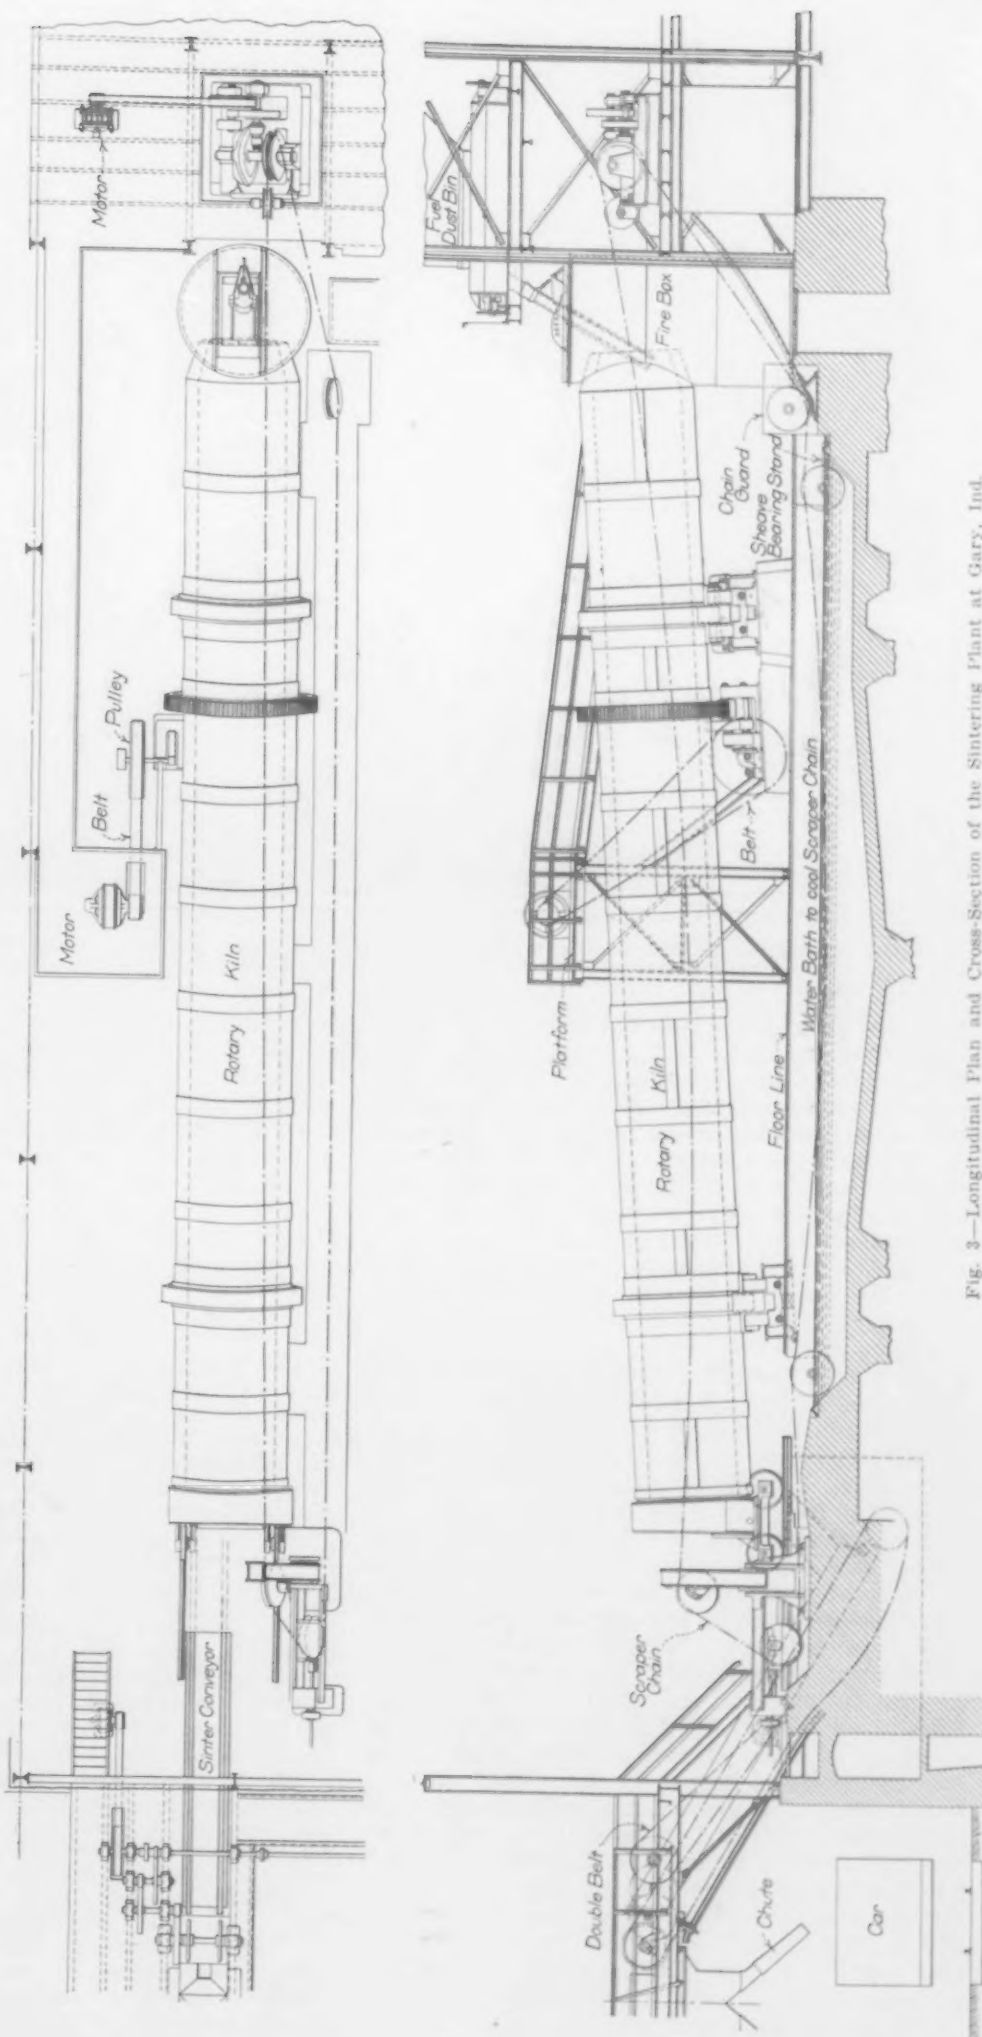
Longitudinal Plan and Cross-Section of the Sintering Plant at Gary, Ind.
